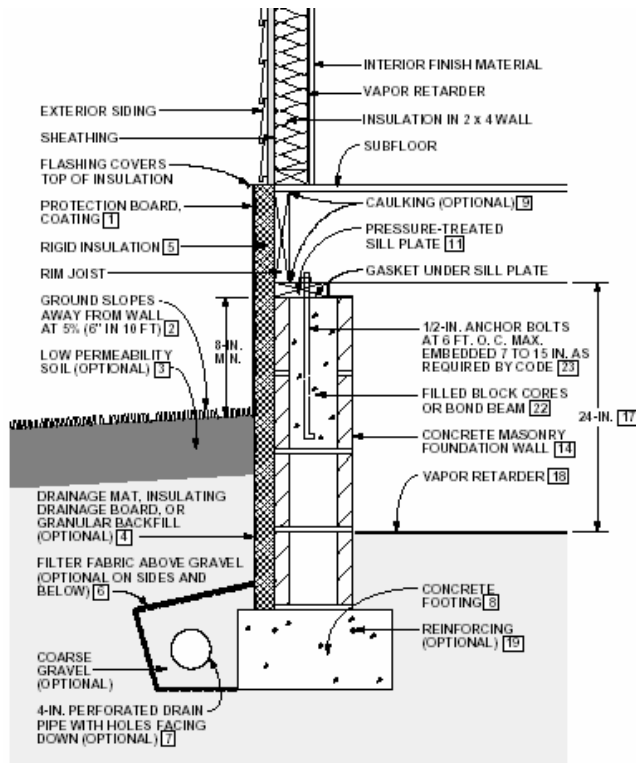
illustrates an unvented crawl space with a concrete masonry foundation wall. The exterior insulation is covered by a flashing at the top. There is no limit to the thickness of insulation that can be used with this approach. The crawl space floor is below the level of the surrounding grade. A perimeter drainage system is shown.
